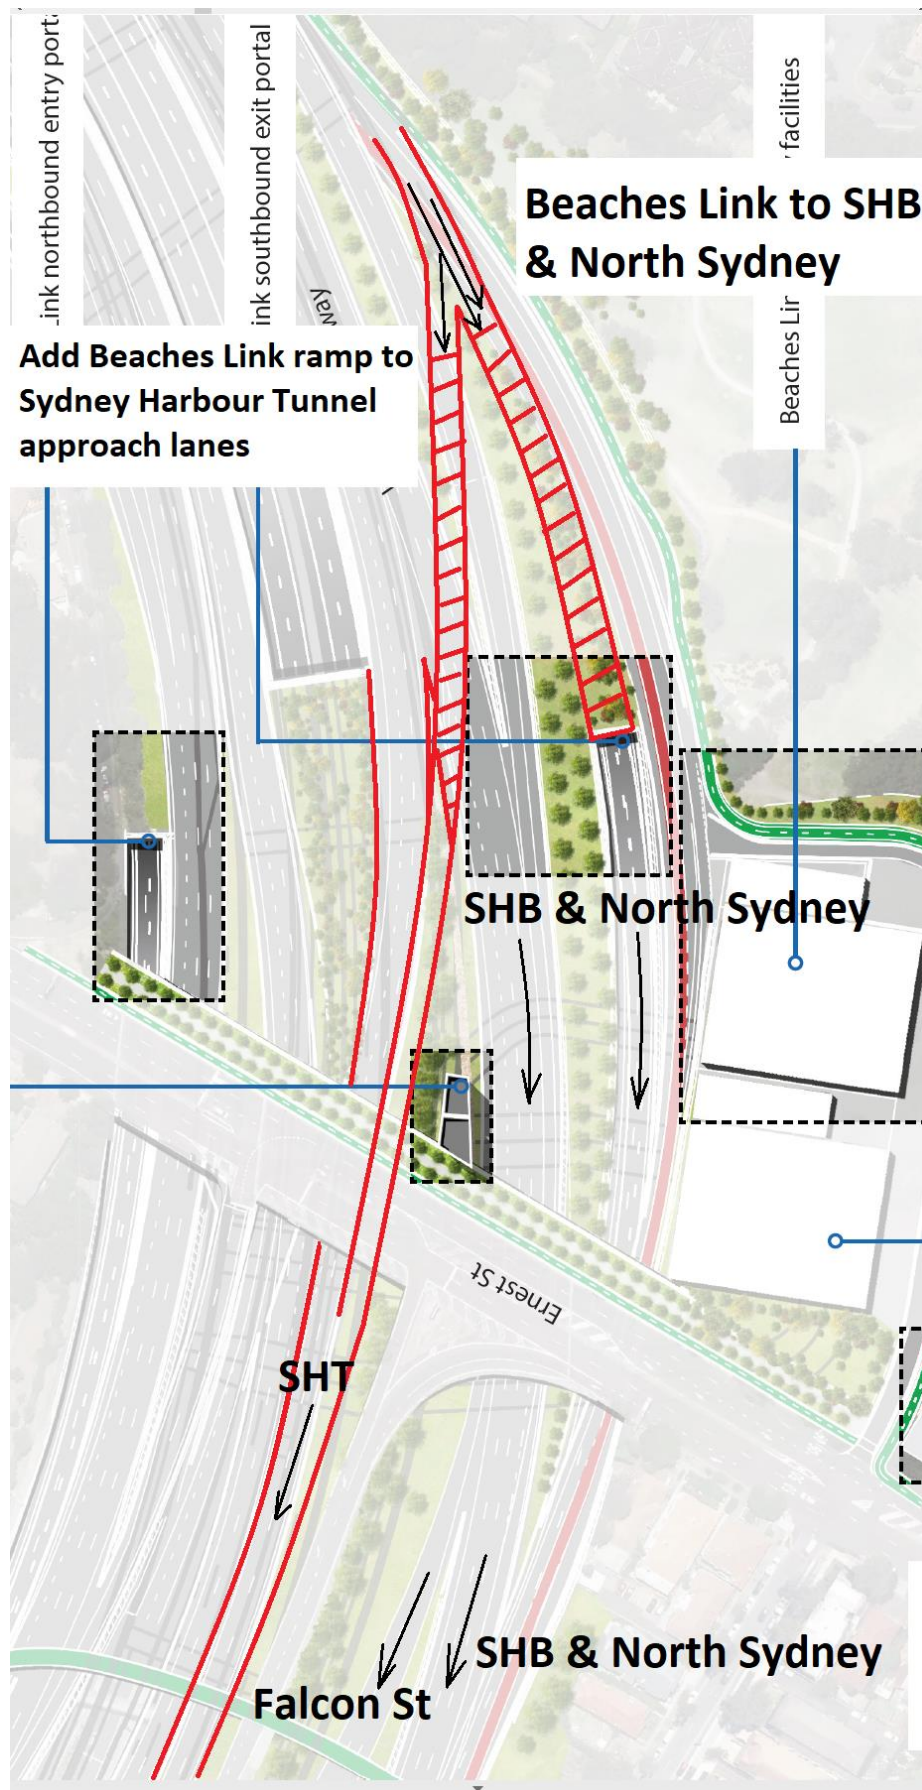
Beaches Link southbound exit to Harbour Bridge and North Sydney bifurcated to provide direct link to Harbour Tunnel ramps
